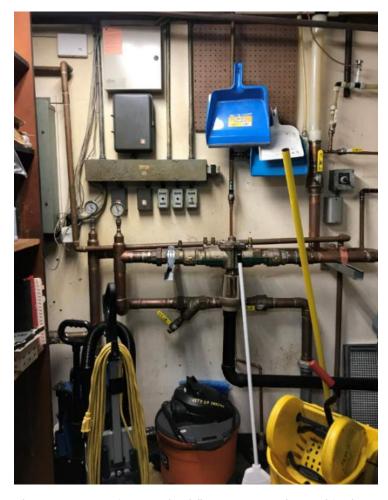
Domestic water backflow preventor located in the Janitor's closet.
